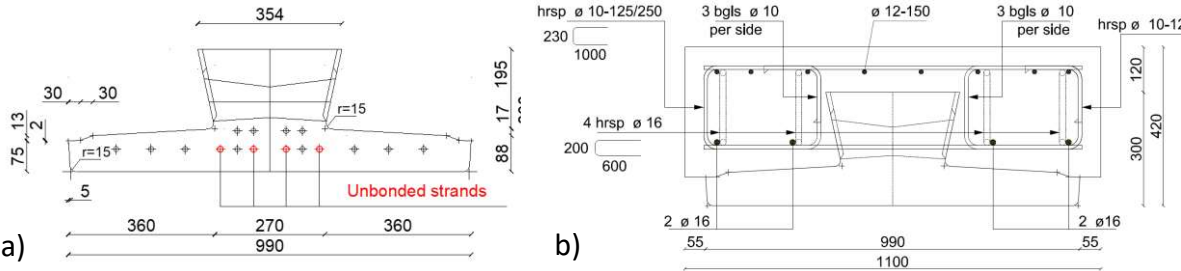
Cross-section of a) prestressed AAC girder with the layout of prestressing strands (16 strands $\phi 12.9$, 4 of them being debonded over a length of 1m) and b) composite girder with the layout of reinforcement in topping concrete.
